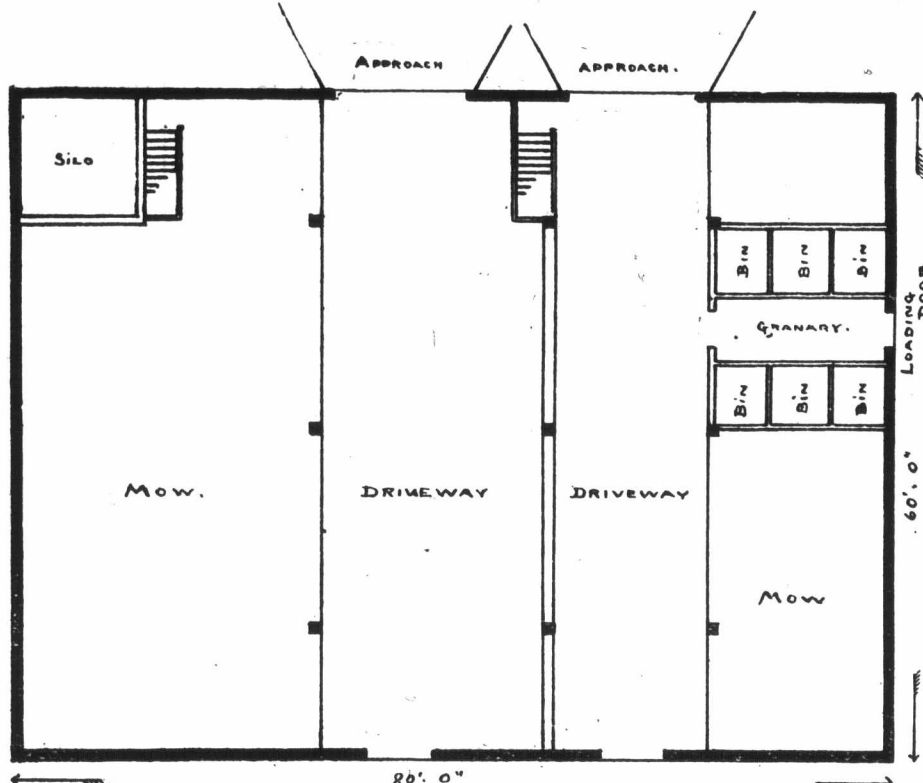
FIG. A. — BARN FLOOR PLAN — SIDE DRIVE.
